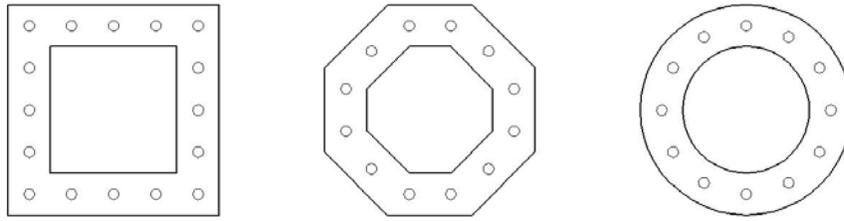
Hollow prestressed UHPC sections initially considered in the study
